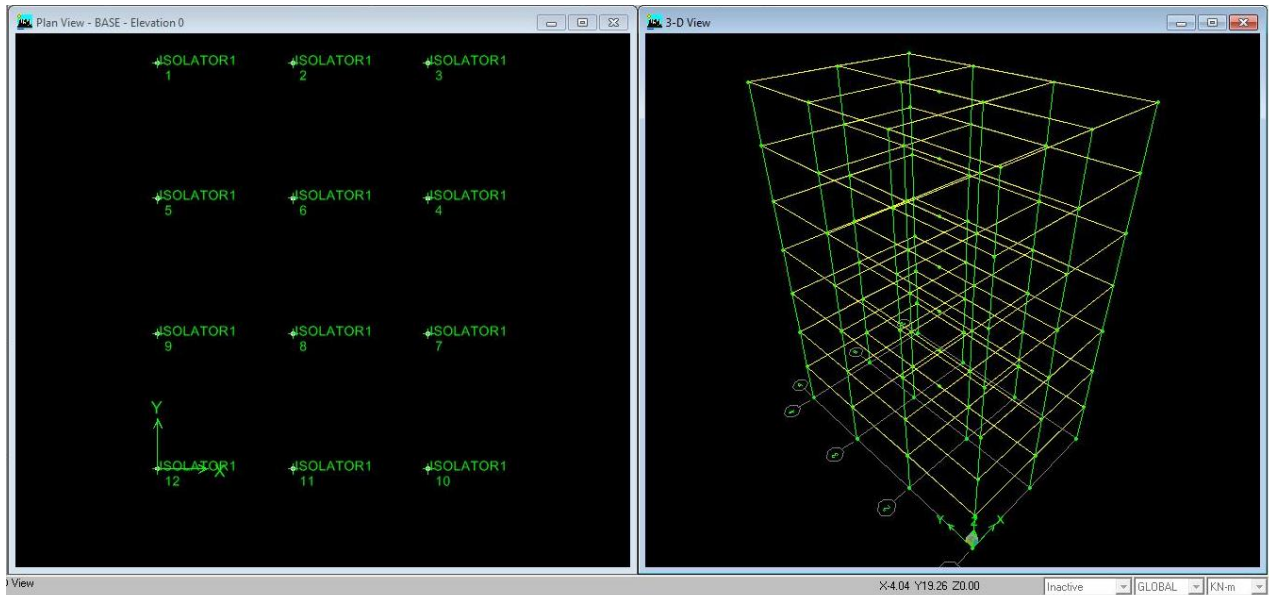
Plan & Elevation of Building Retrofitted With Isolators
